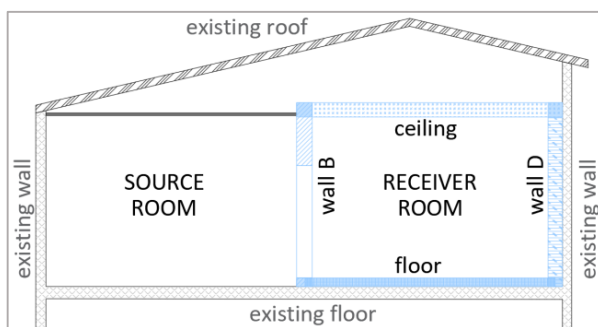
Cross section of the test facility: The existing structure is shown in grey and the new structure in blue.
